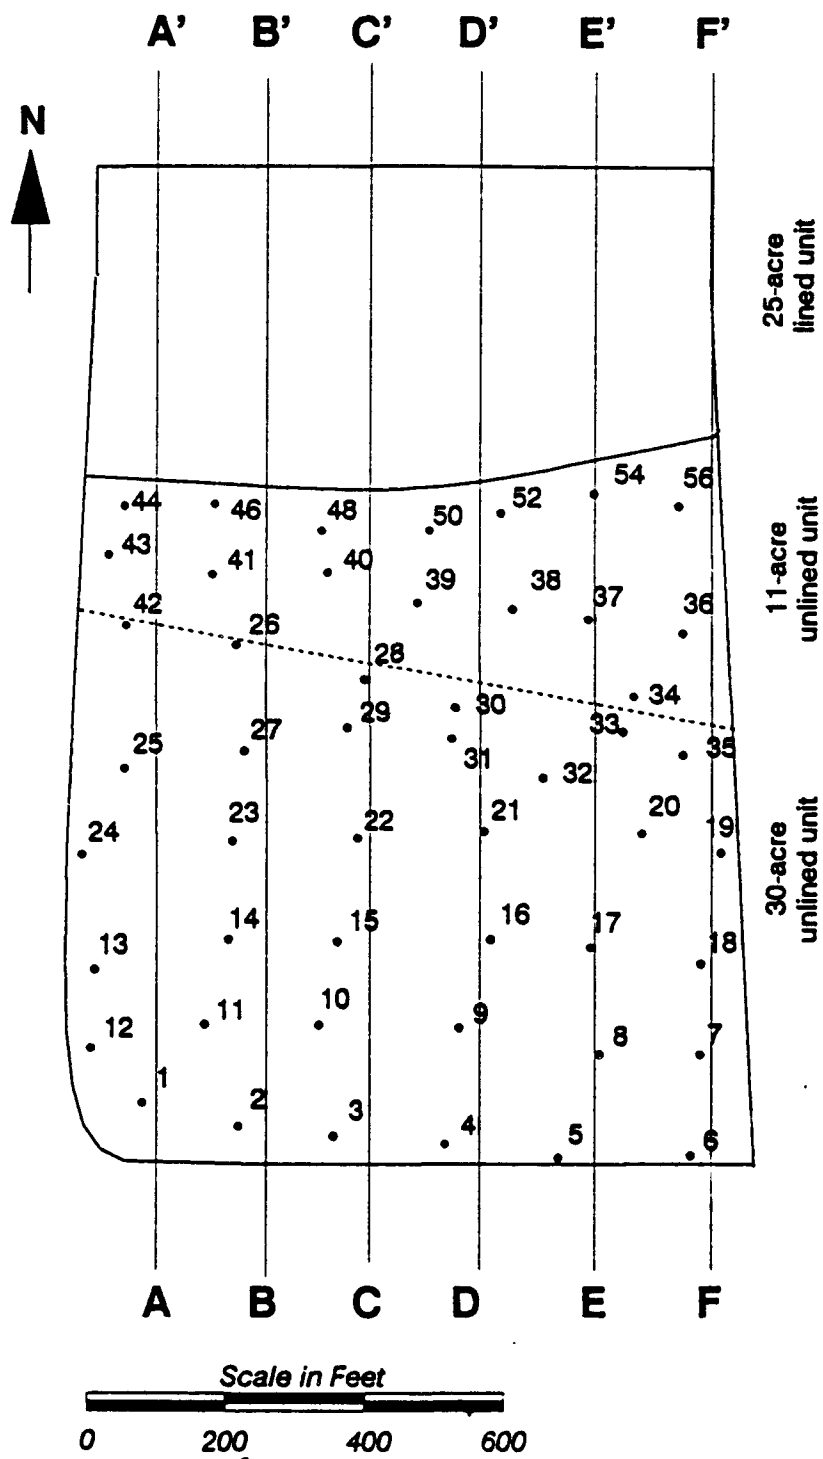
Gas Vent Layout with Cross-sections Shown
